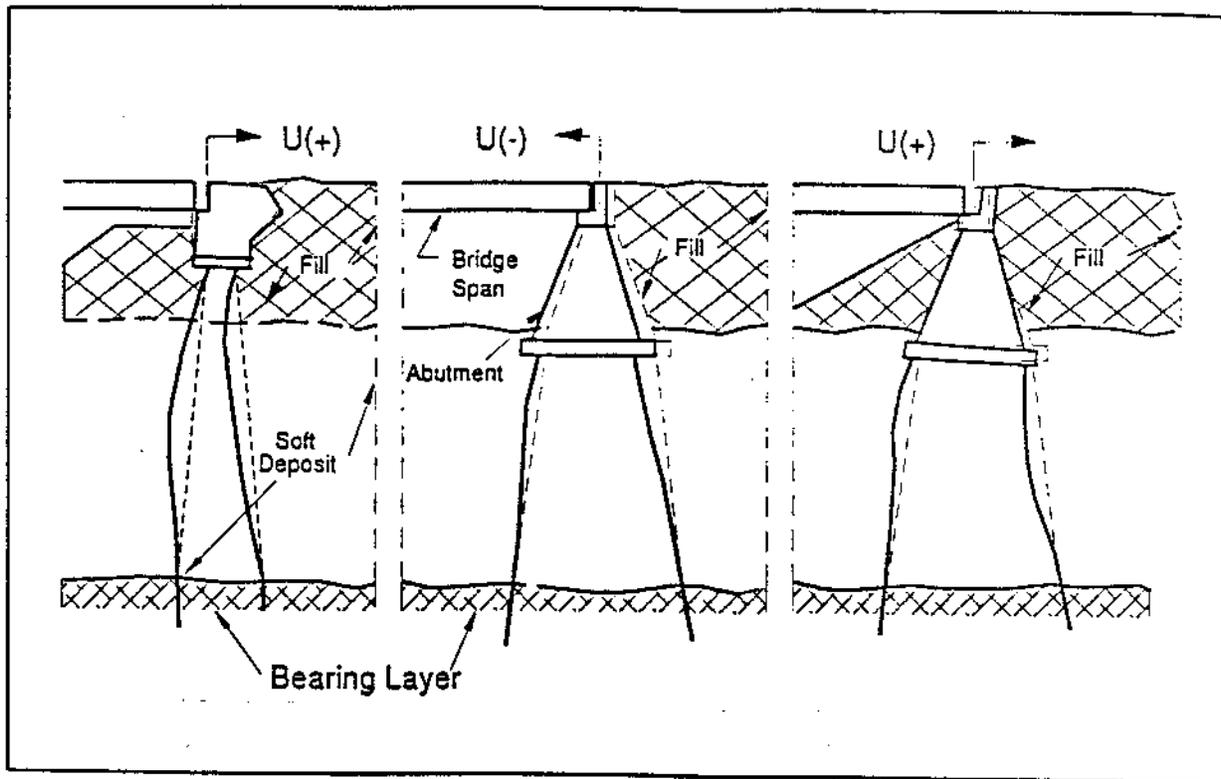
ABUTMENT TILTING DUE TO LATERAL SQUEEZE.
